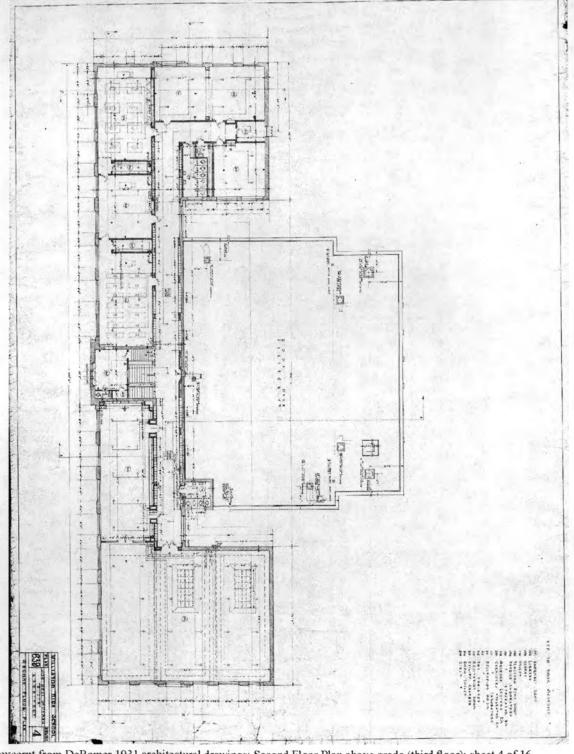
excerpt from DeRemer 1931 architectural drawings; Second Floor Plan above grade (third floor); sheet 4 of 16
